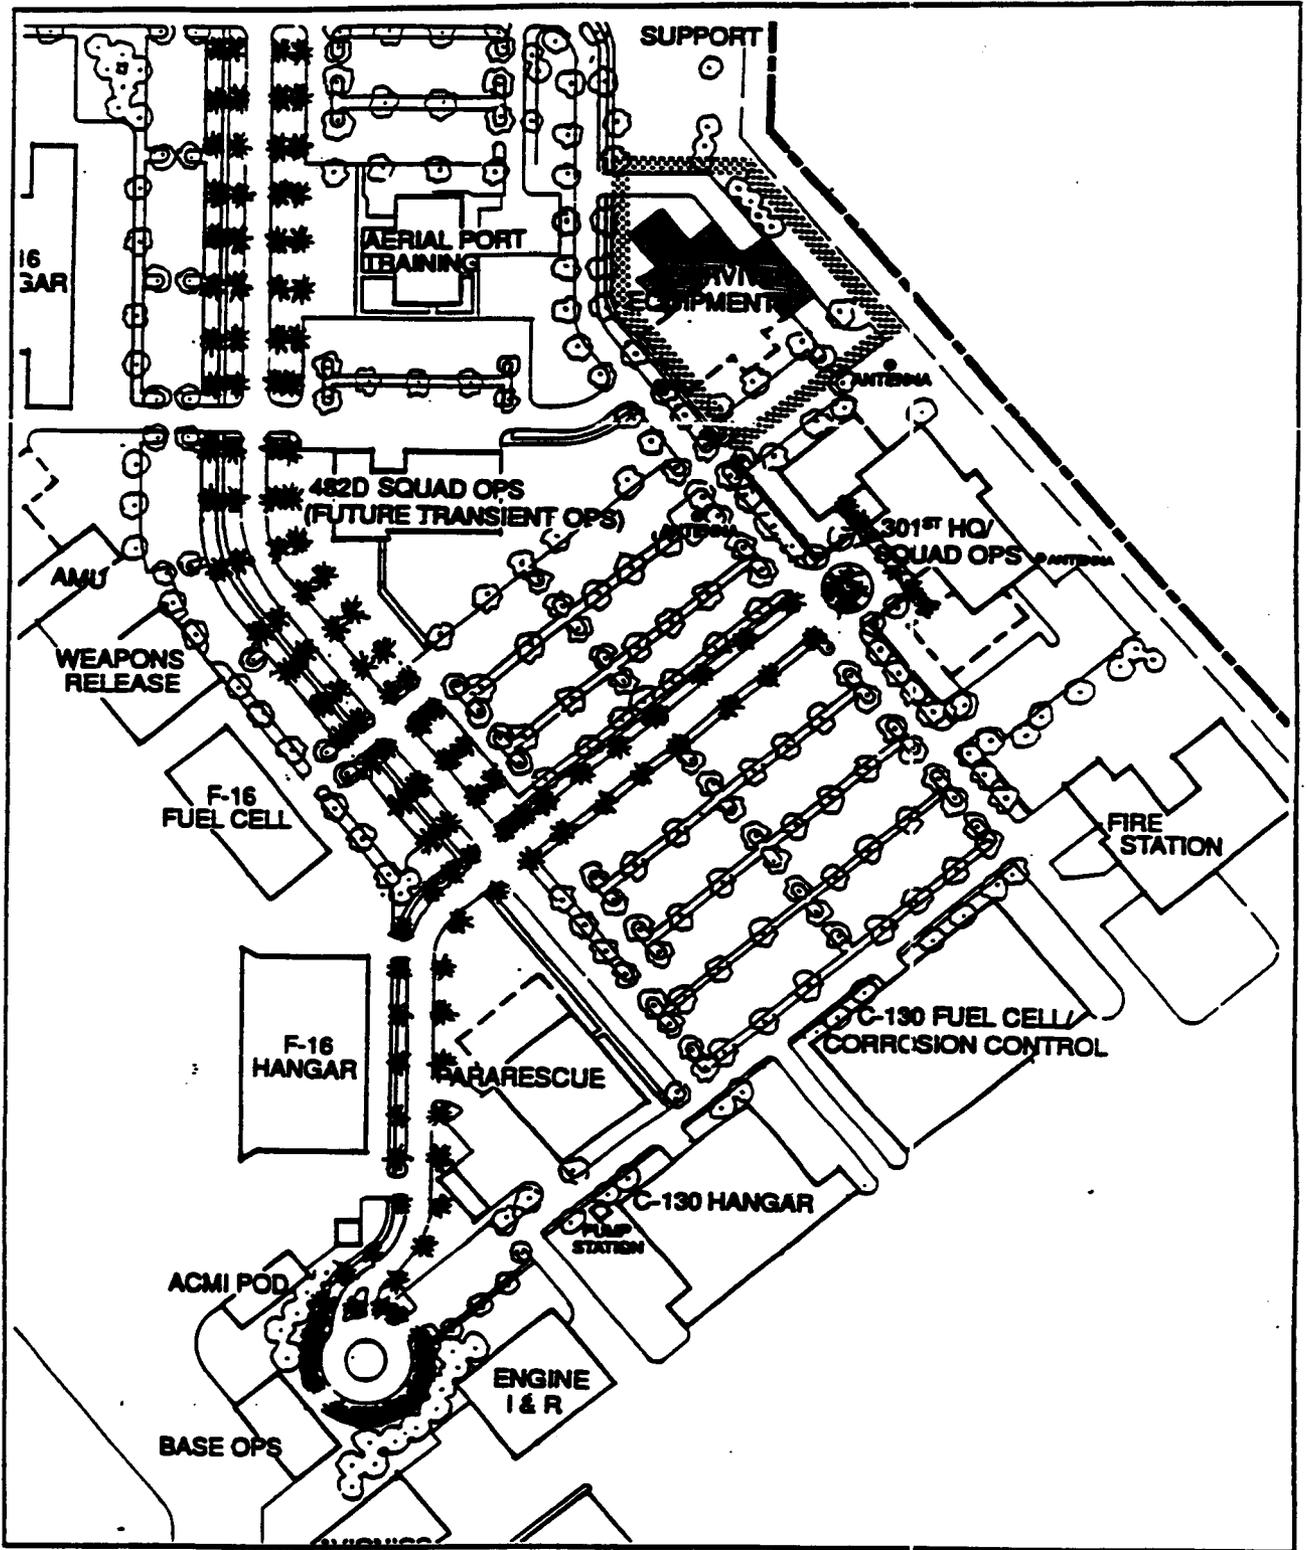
Area Development Plan for Survival Equipment Shop
